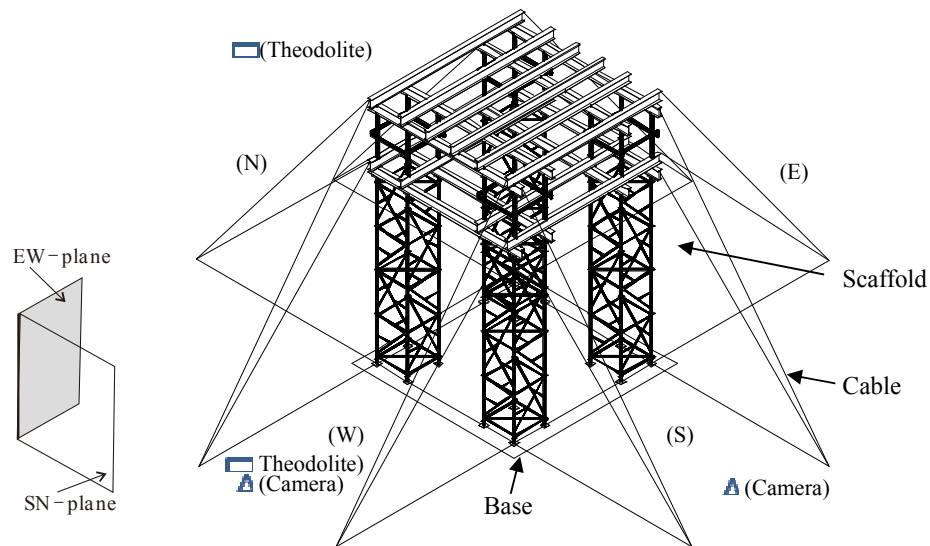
B. Setup for Outdoor Load Test of Heavy-duty Scaffolds with Shores
